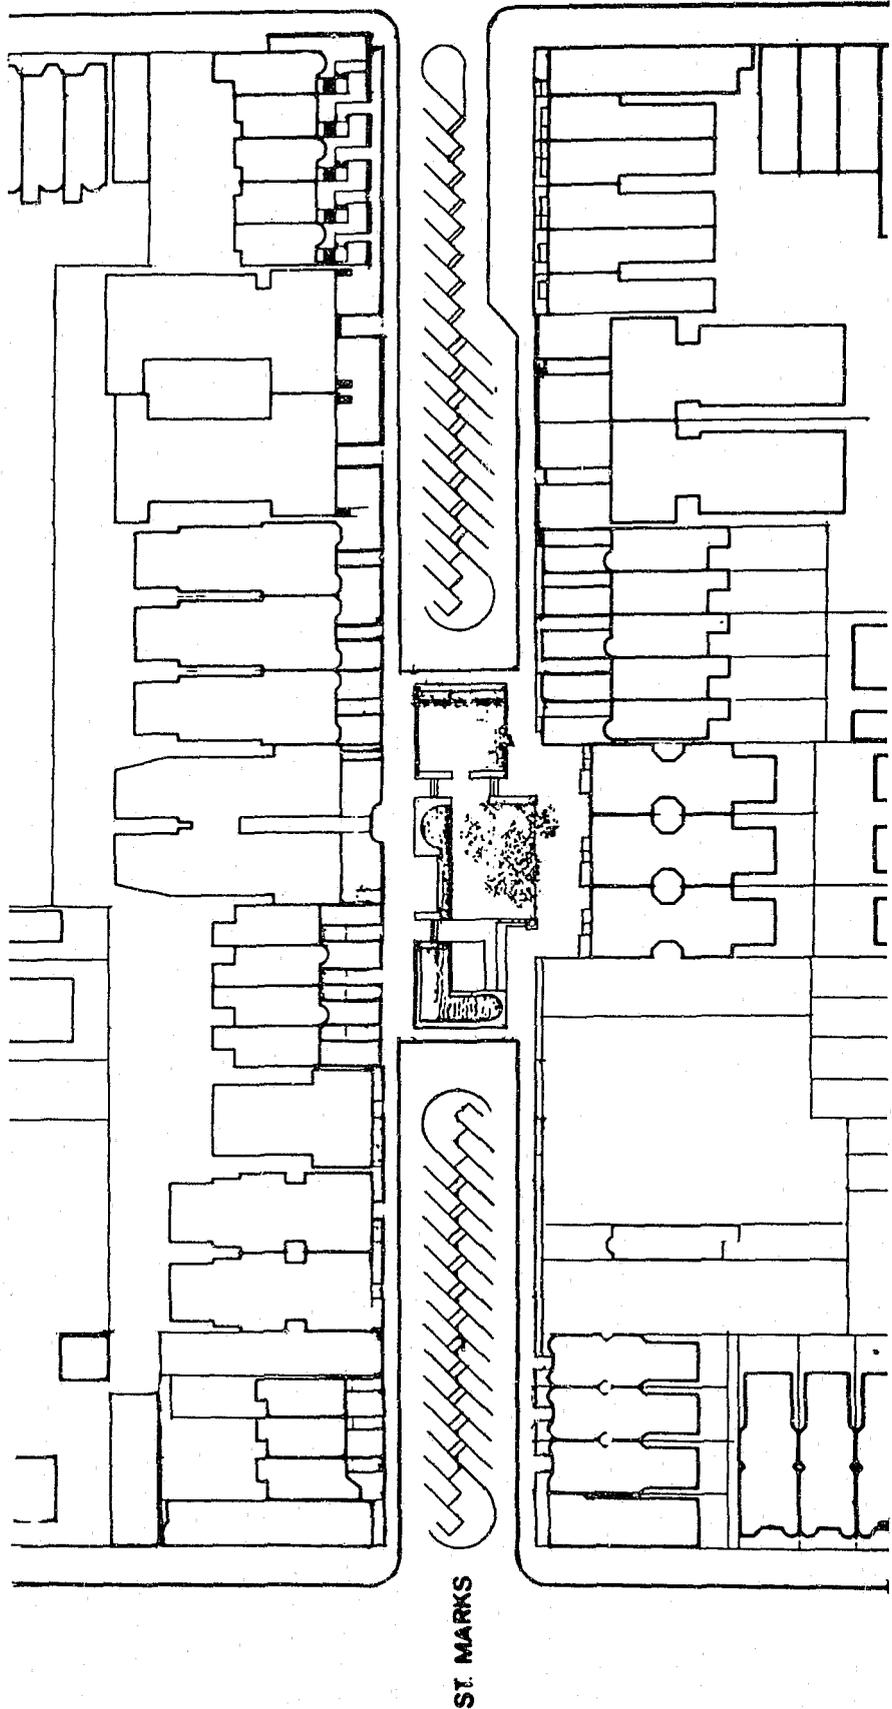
St. Marks Place, Brooklyn, N.Y. Site plan.
